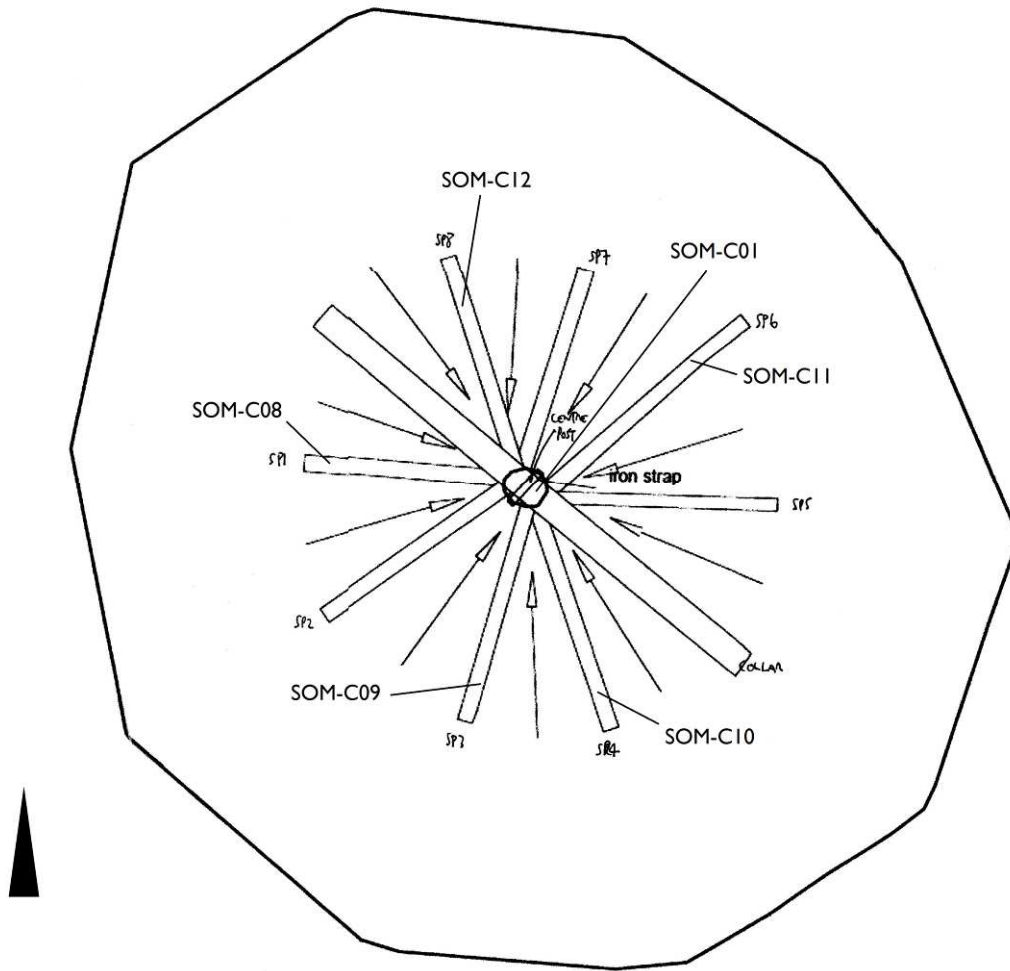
Plan of the tower timbers, showing the location of samples SOM-C01 and SOM-C08–12 (after Hoare Ridge & Morris)
